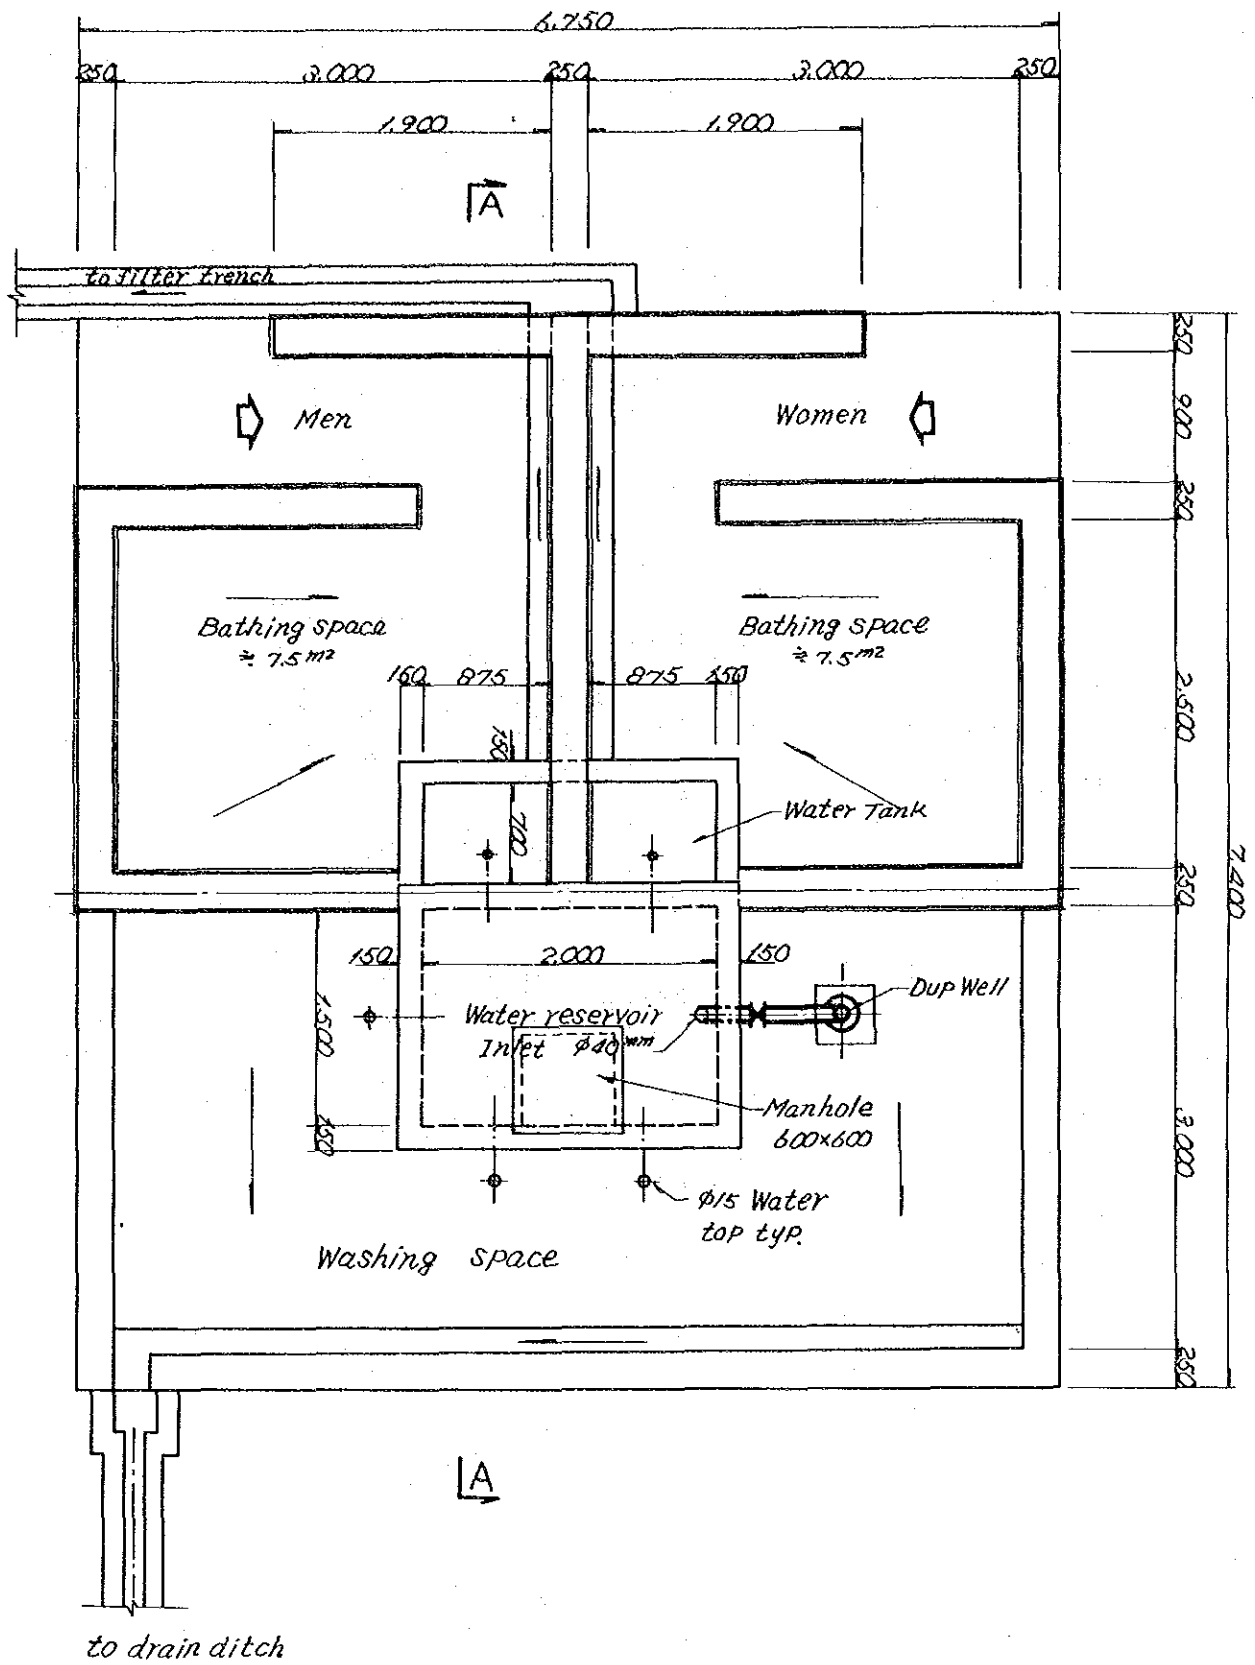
TYPE - C FACILITY - PLAN S=1/50
